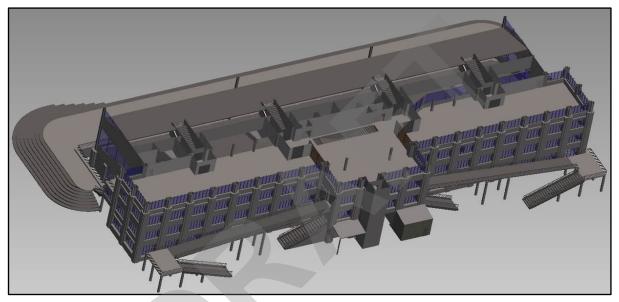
Cutaway showing walls and columns at the third floor level at GNS
